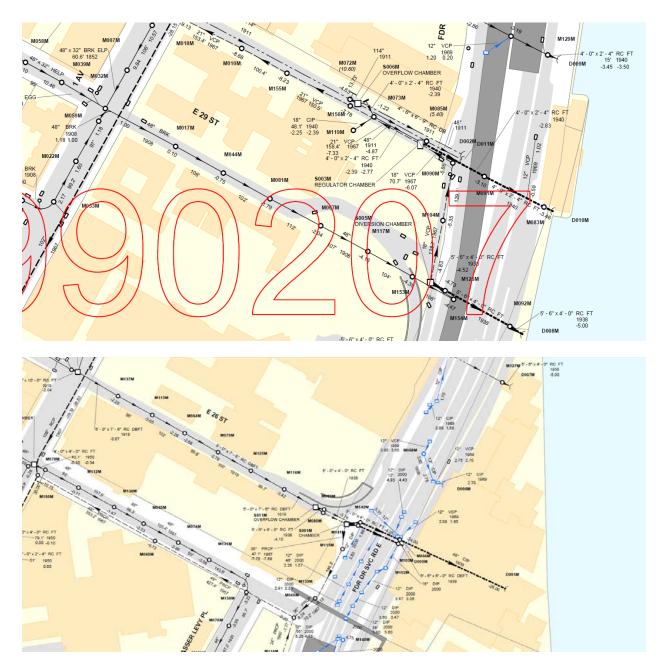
NYCDEP SEWER MAP SHOWING EXISTING SEWERS ADJACENT TO BELLEVUE HOSPITAL. TOP-ZOOM INTO 29<sup>TH</sup> STREET SEWER. BOTTOM-ZOOM INTO 26<sup>TH</sup> STREET SEWER.
